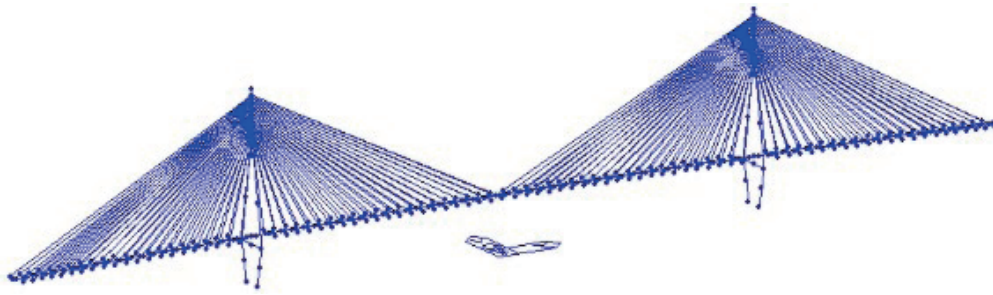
(Color online) 3D finite element model of Jintang Bridge in Zhoushan.
